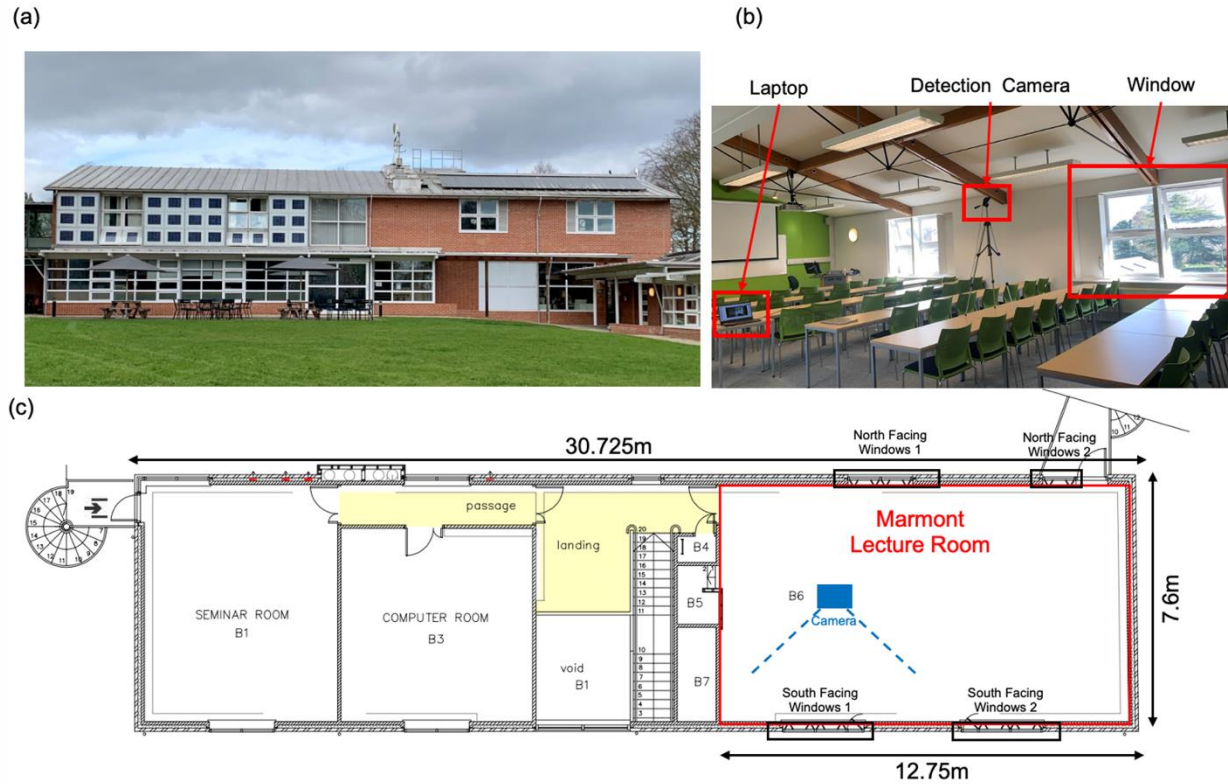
(a). Marmont centre at the University of Nottingham, UK. (b). Set up for the experimental tests 1 - 5, with the floor plan of the first floor of the building in Figure (c).
